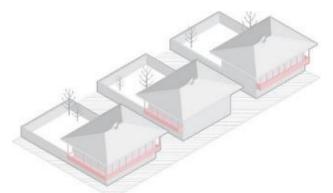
Types of balcony construction in the public façade of the house. Source: Authors.
